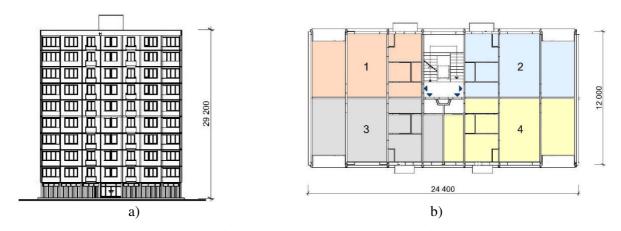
A typical representative of apartment dwelling house LB, a) front view and cross-section, b) floor plan [20]
